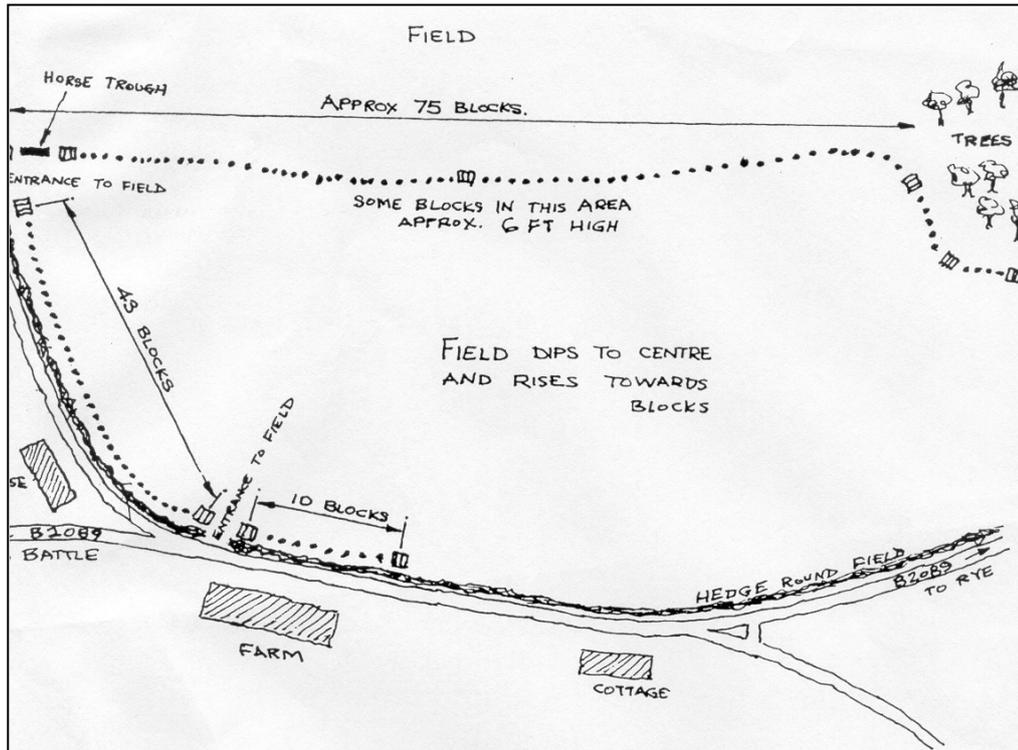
Plan of one sector of the concrete anti-tank block perimeter at Swaile's Green west of Cripp's Corner.⁶
